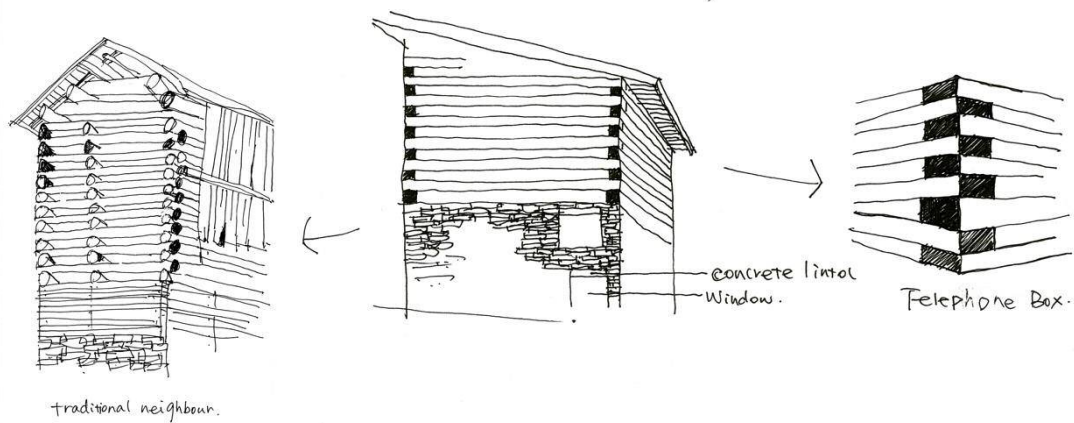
The traditional farmhouse, the renovated cowshed, and detail of the timber joint Strickbau.
